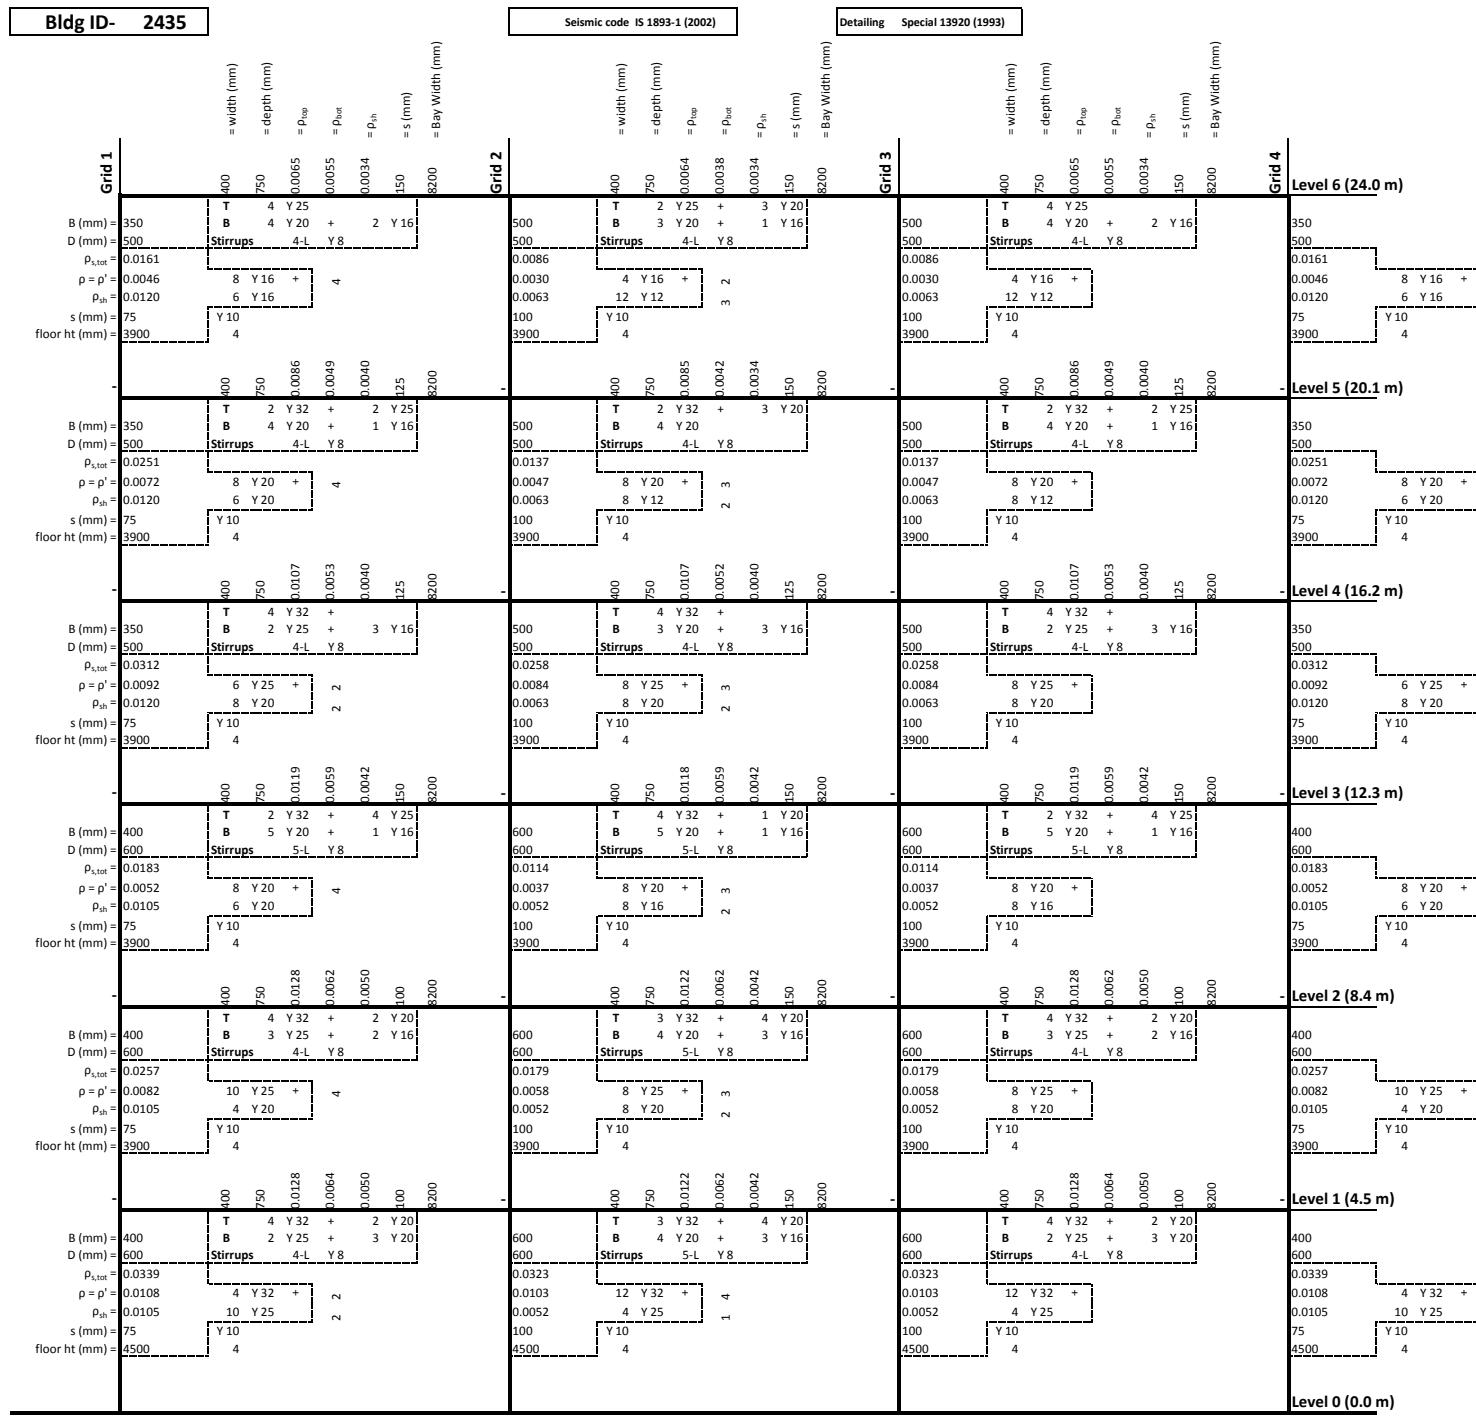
Provided reinforcement and modeling details for building ID 2435
